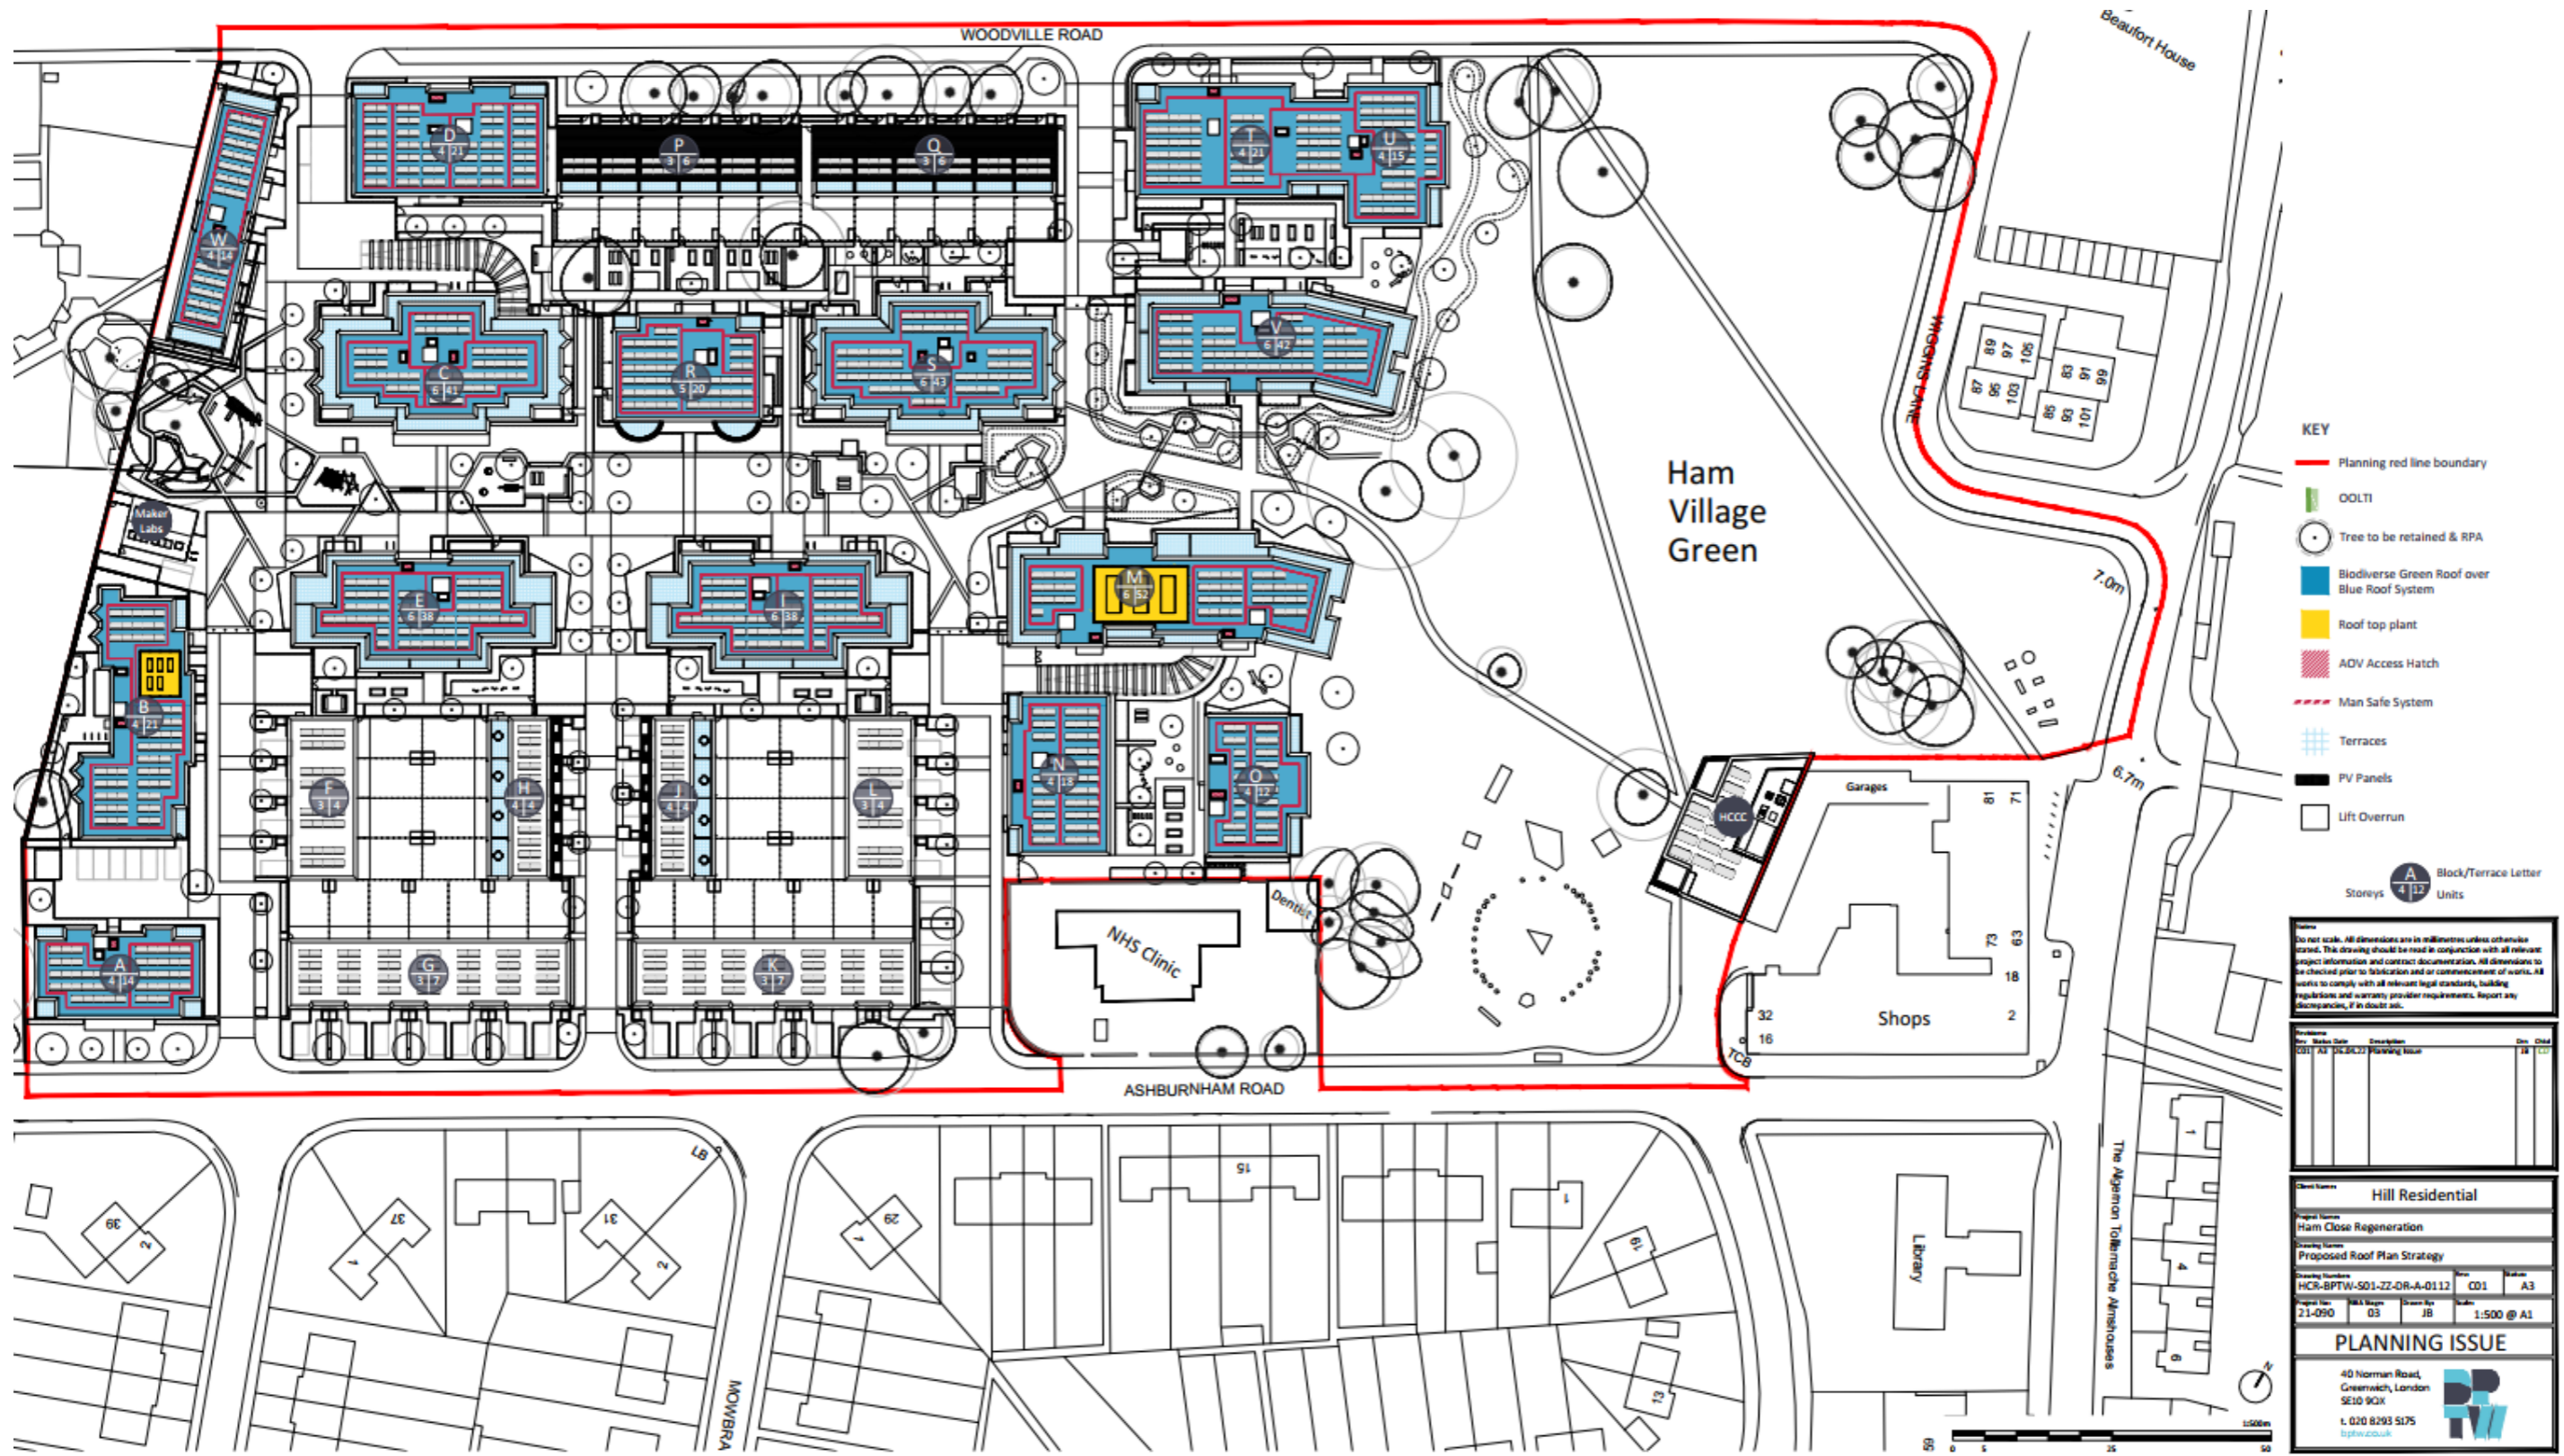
Proposed Roof Plan showing indicative PV layout (BPTW drawing HCR-BPTW-S01-ZZ-DR-A-0112)
